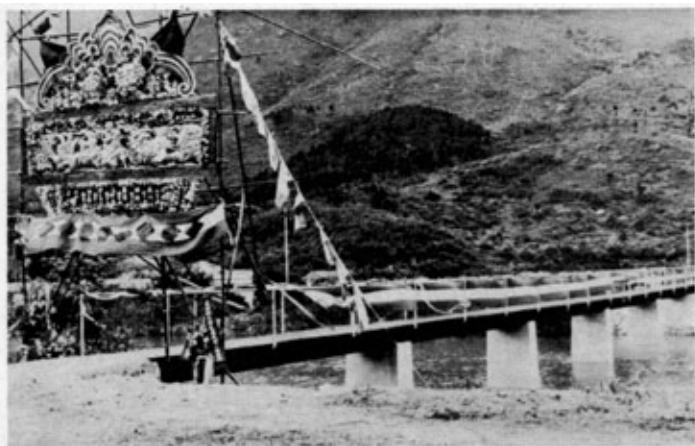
Tung Chung Footbridge decorated for the opening ceremony. The bridge was constructed by a Troop of 11 Field Squadron in twenty-eight days.
